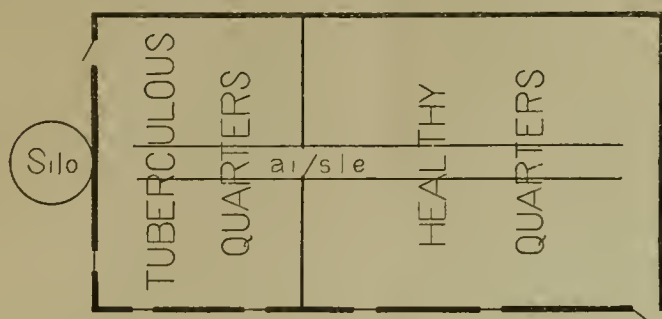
Ground-plan of barn, showing arrangement of herd.
